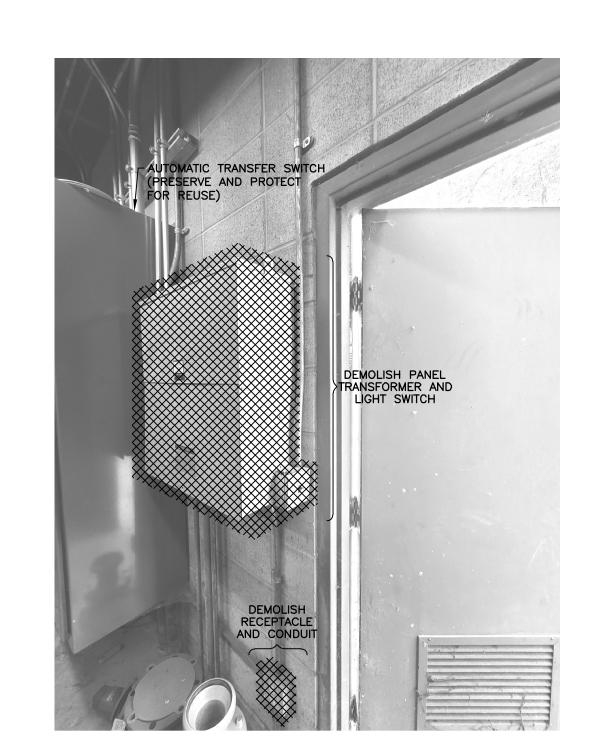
/E-9 EAST WALL SCALE: NONE
